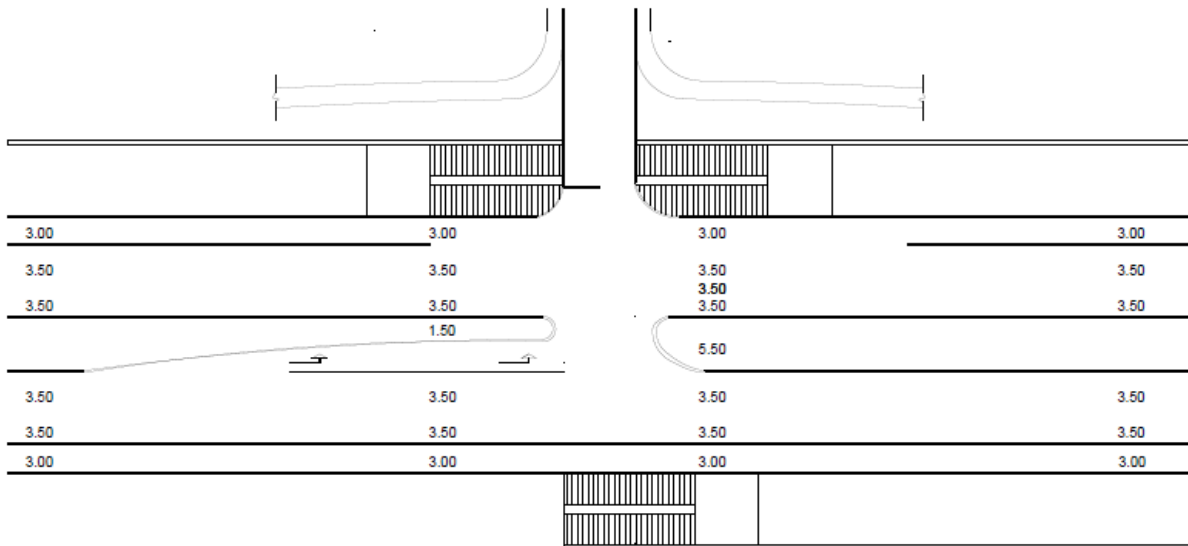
Proposed Road and Lane Configuration Design for Chancellor Boulevard
